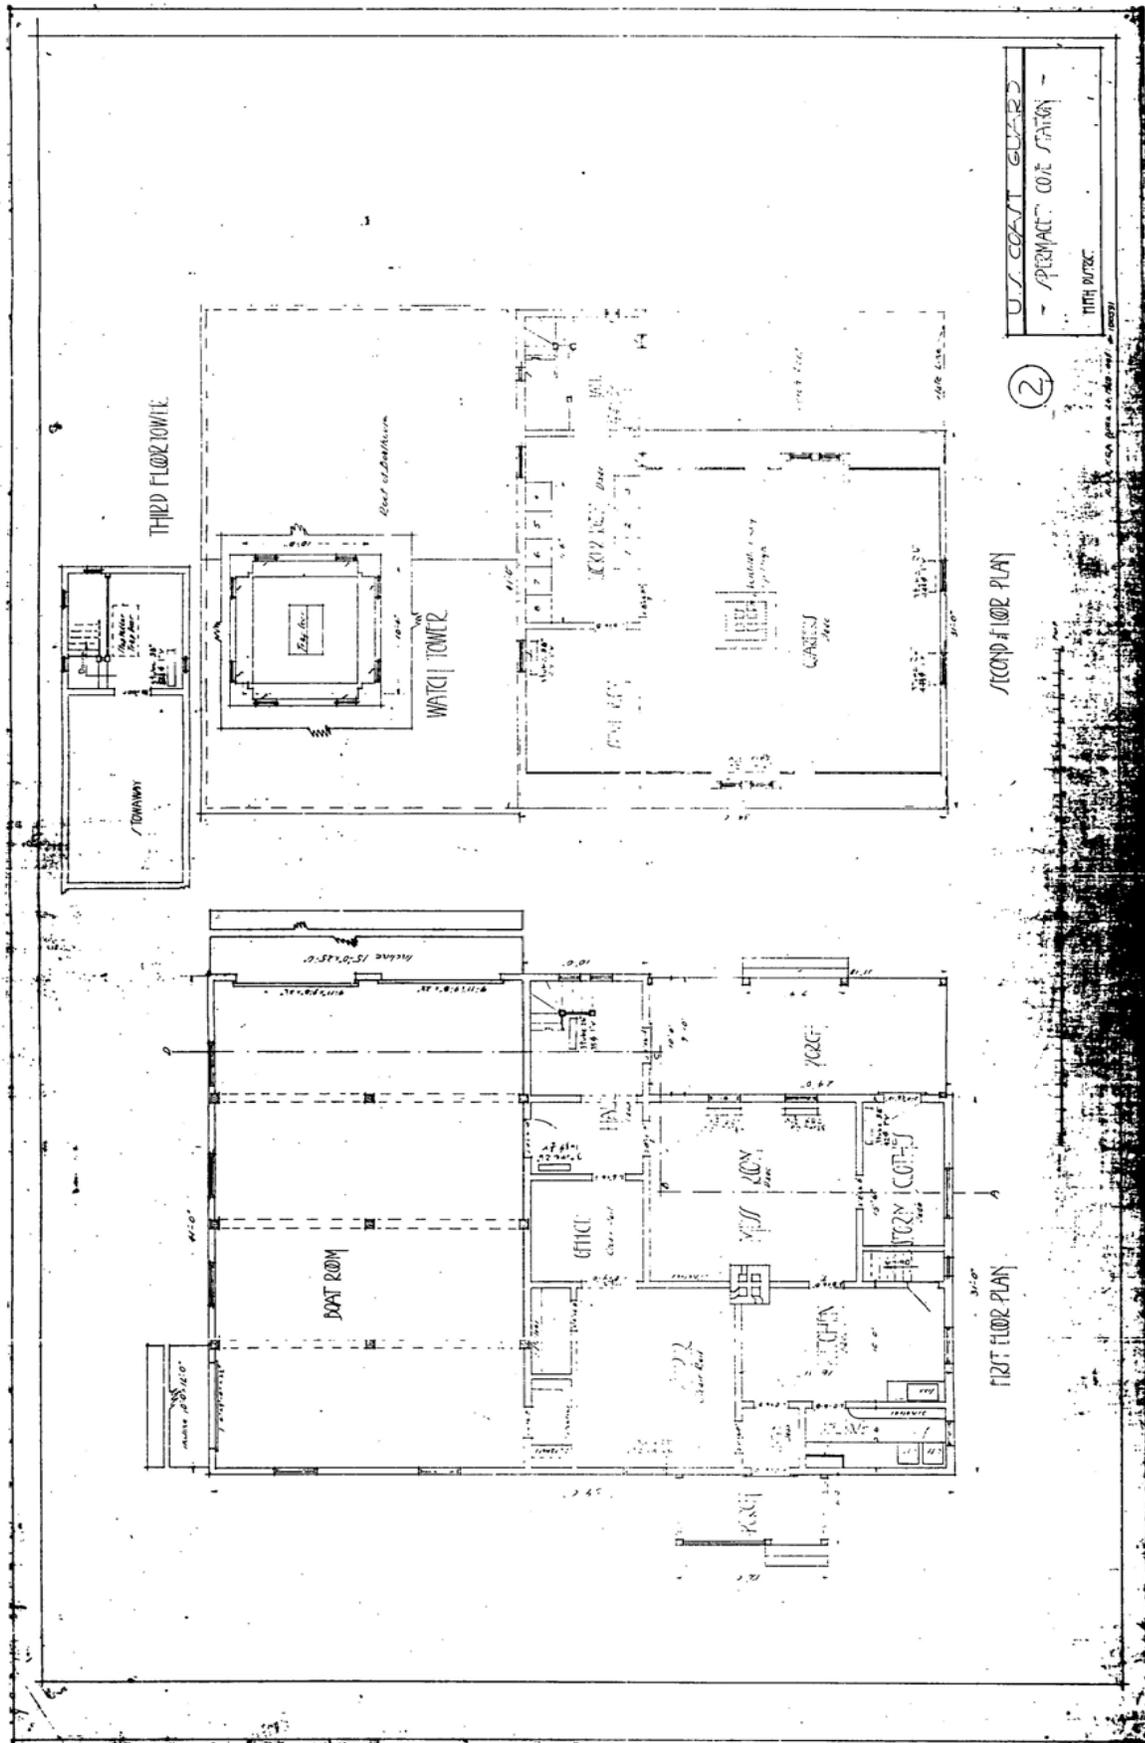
Plan of Spermaceti Cove Station, Fifth District, U.S. Coast Guard, April 24, 1928, depicting 1909 alterations to the station including the addition of the basement staircase closet at the west end of the Storm Clothes Room. Note the south elevation window opening for the Storm Clothes Room appears to be extant in 1928.
